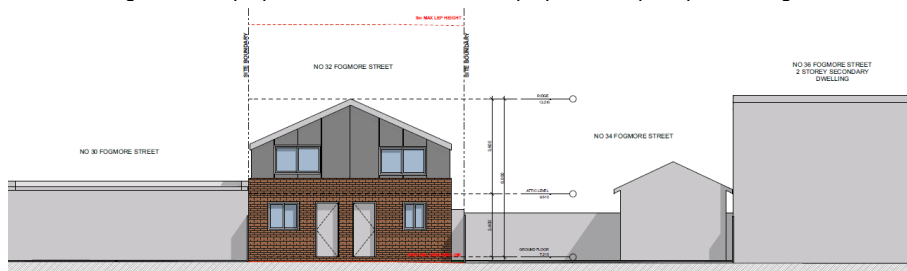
The proposed internal elevation of the proposal facing the principal dwelling
